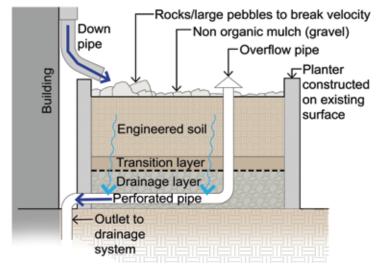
Cross section through bioretention planter from disconnected downpipe
